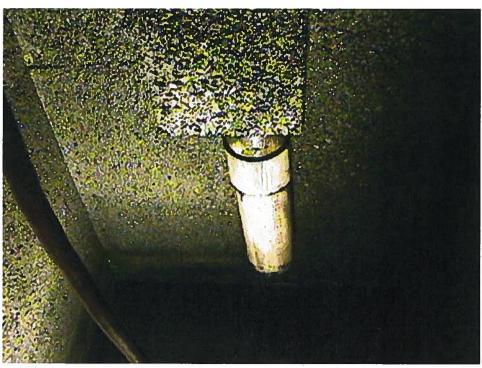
Interior of Oil/Water Separator. 4" PVC Outlet Pipe Visible on East Wall of Tank (February 2008).
